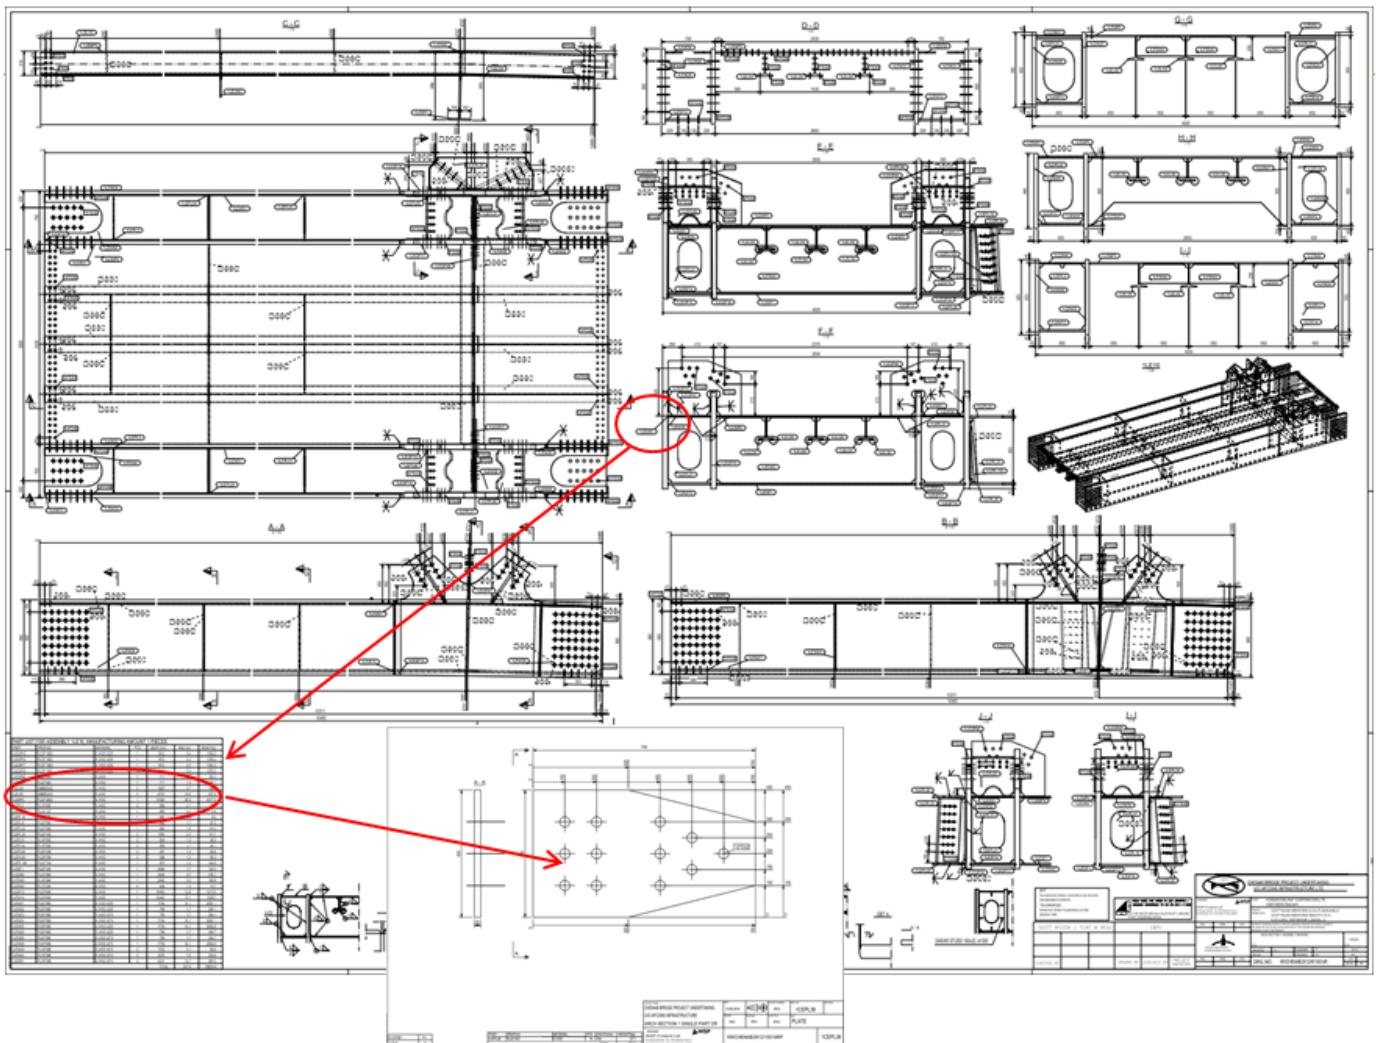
Automatically created parts of the numbered assembly and single-part drawings
